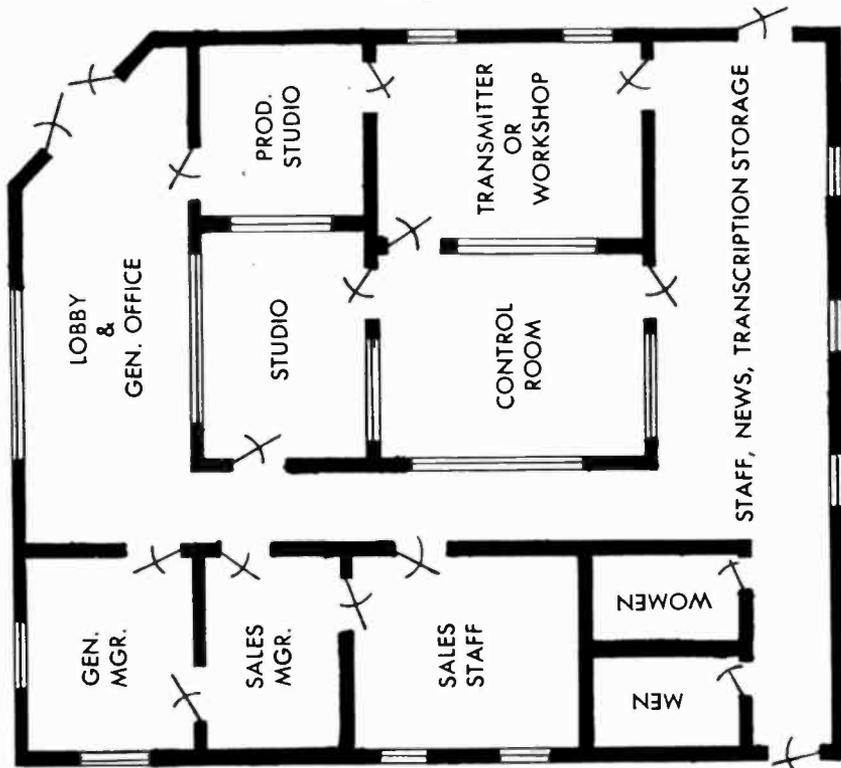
"Plan 1" small-market, minimum-staff layout.
